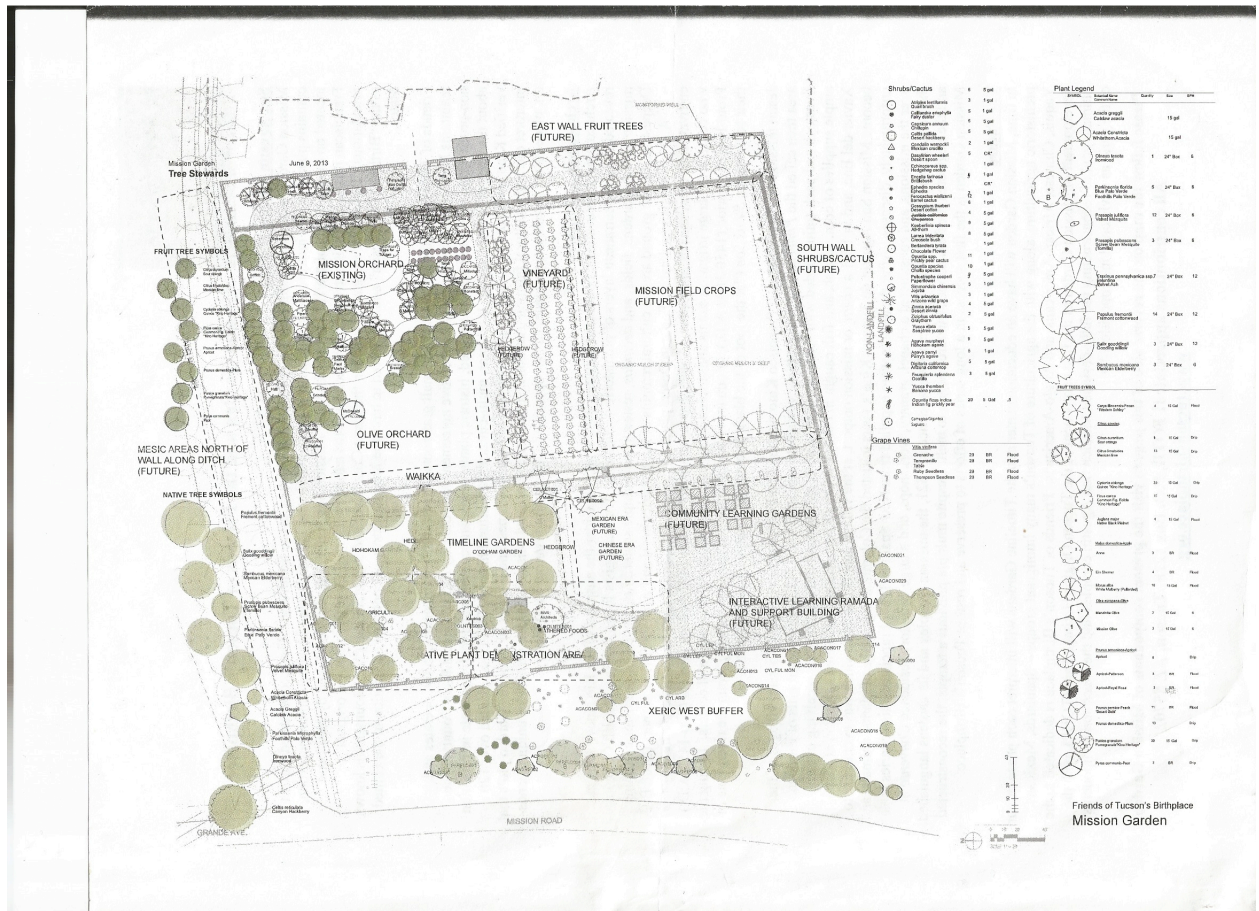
Mission Garden Site Plan, showing both existing and future gardens.
